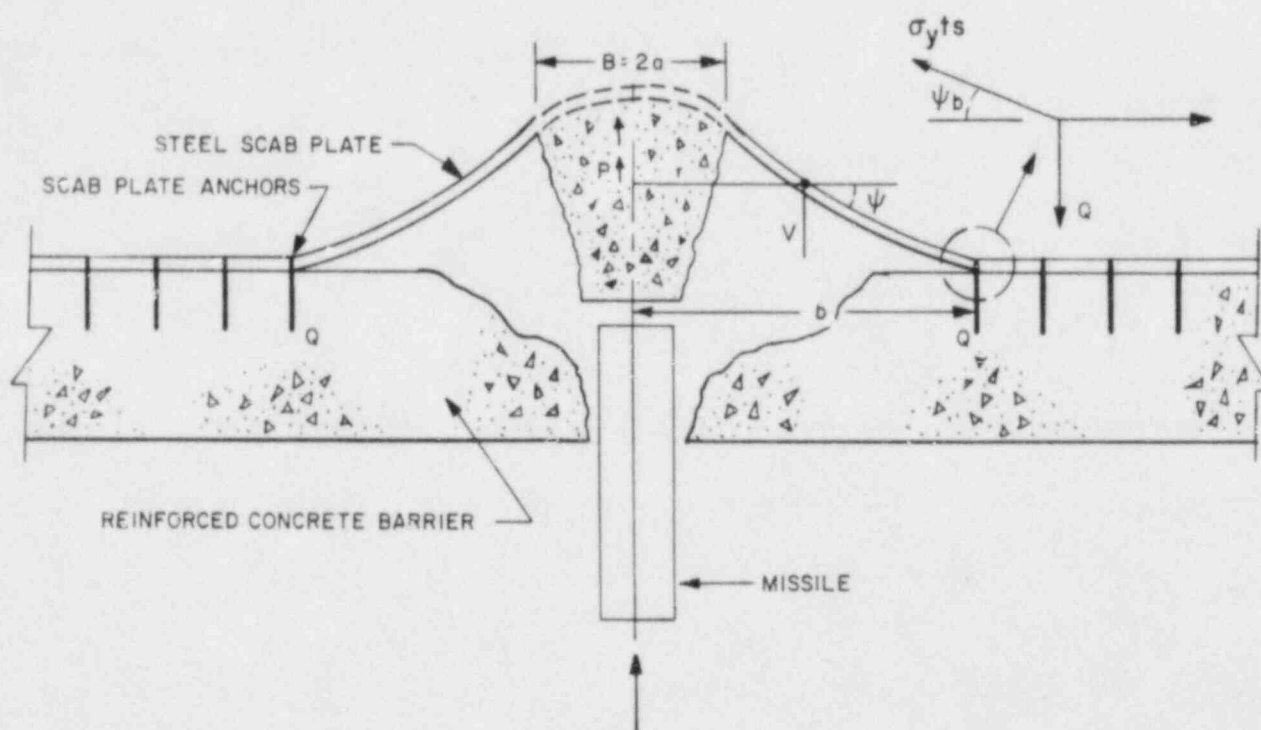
DEFORMED SHAPE & FORCES ACTING ON SCAB PLATE
